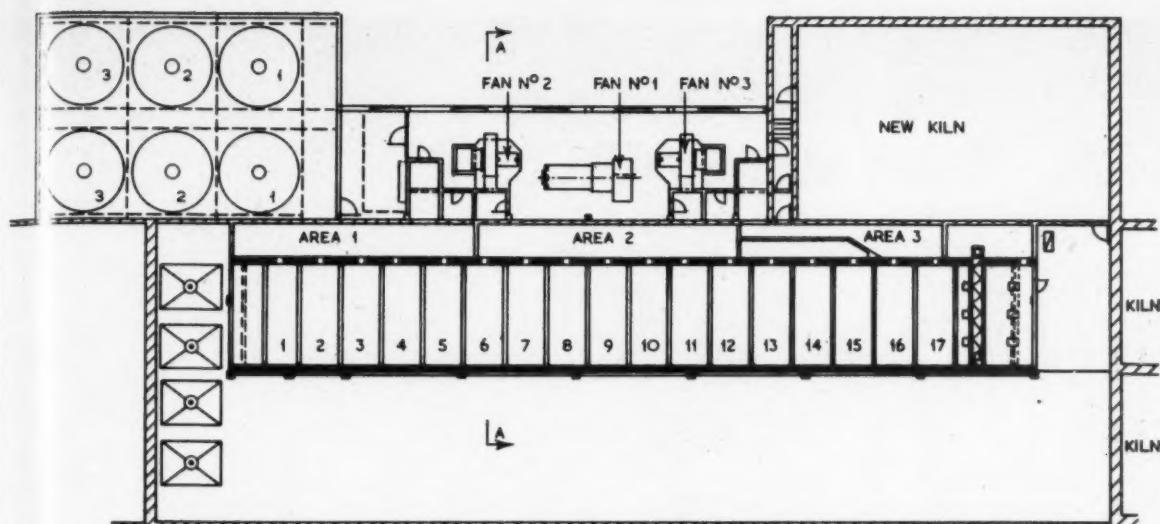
Ground plan of steep house; control room with air conditioning and ventilating system, and germinating room
